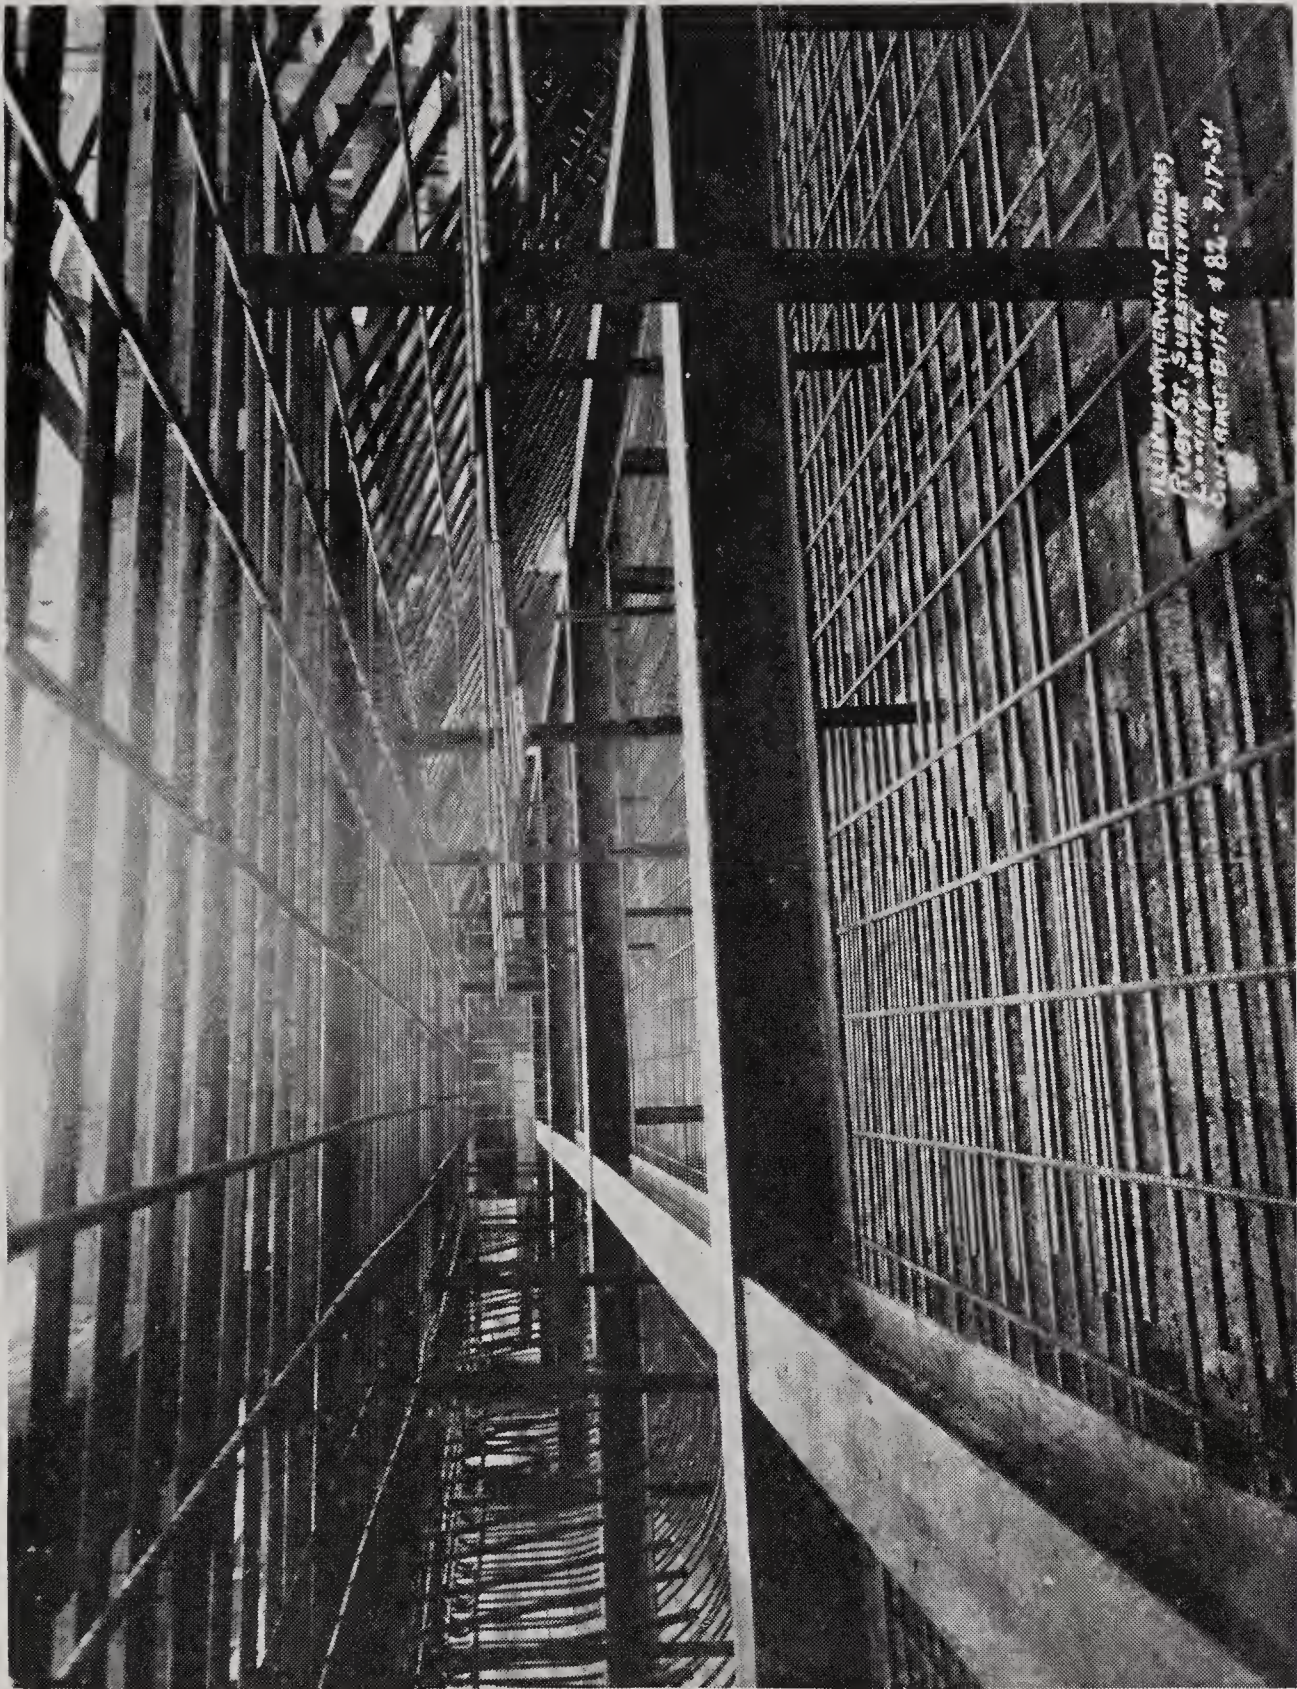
Ruby Street Bridge, Joliet. Steel reinforcement for bottom slab of East Pit, showing top and bottom reinforcement and steel cofferdam bracing, which was left in place.
